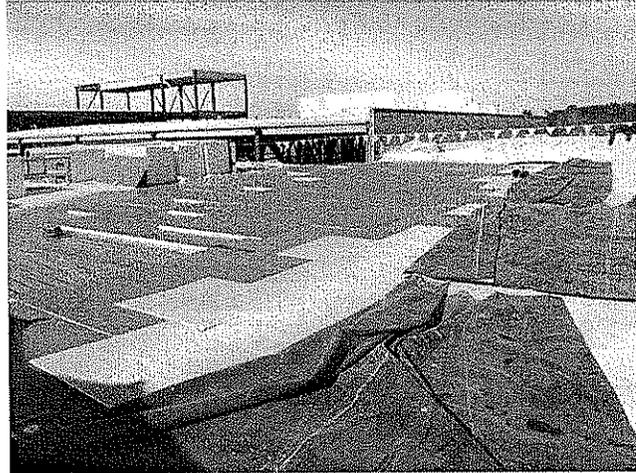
View northwest across the Kitchen/Servery roof. February 16, 2011.
